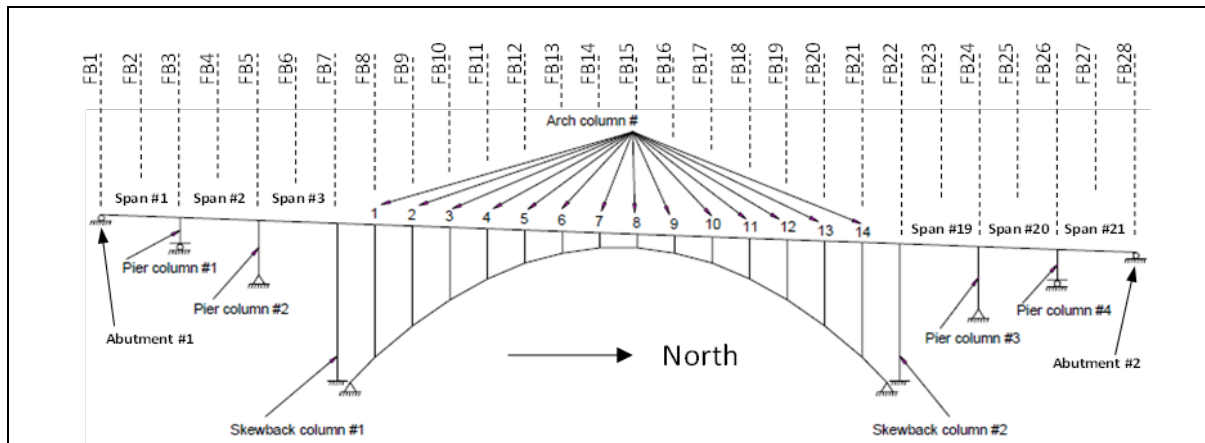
Bridge orientation and numbering – column and floor beam (FB) layout.
